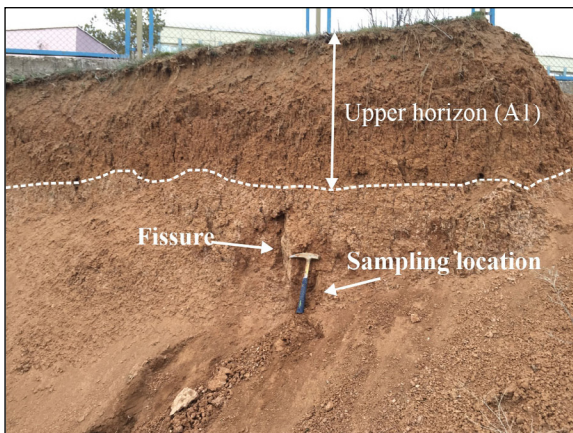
The outcrop where the sampling is made in which the studied clay as a result of the construction foundation excavations is typically observed and sections where plant roots are not present (sample N1; latitude 39.897020° and longitude 32.778787°; look direction NE).
